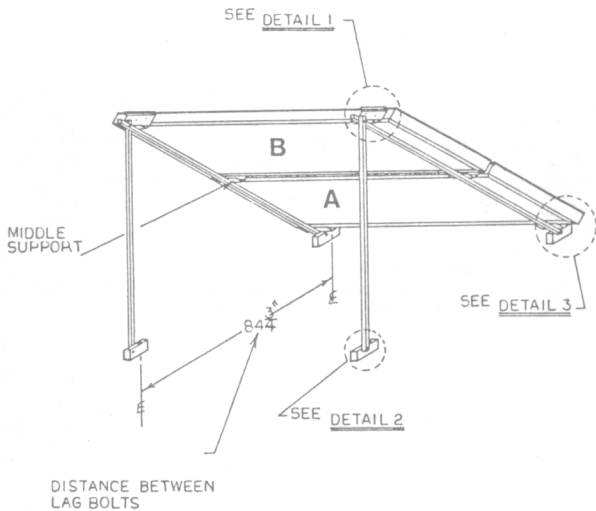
INSTALLATION DETAILS FOR FLAT OR SLIGHTLY SLOPED ROOF RACK
